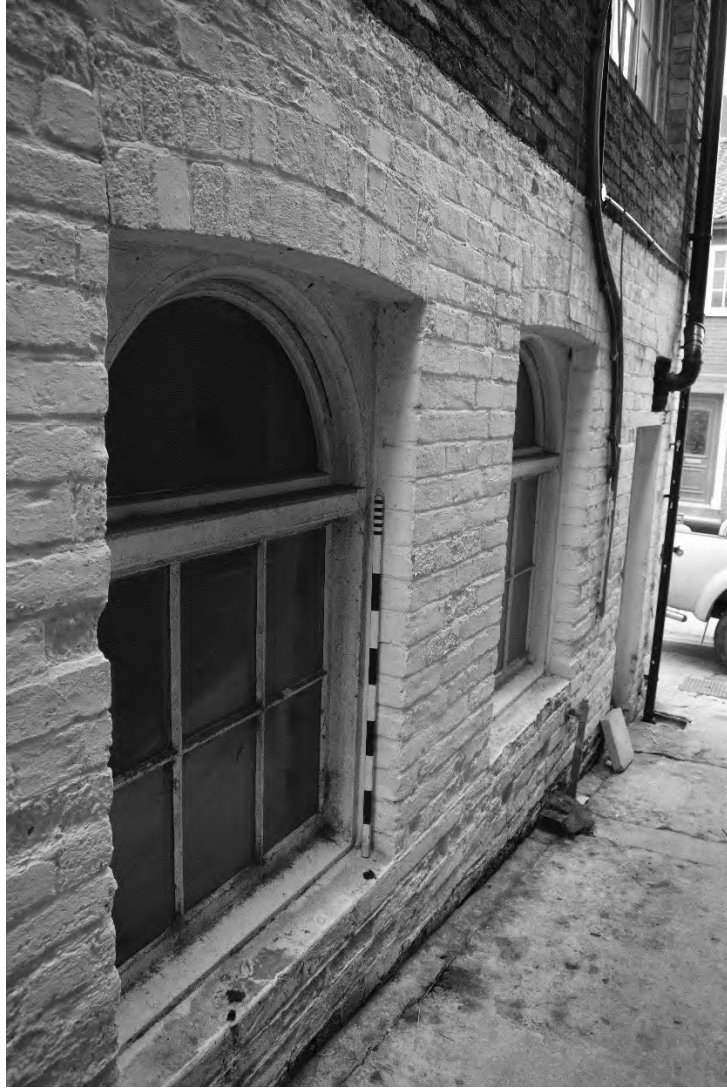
Exterior West Elevation Windows (DSC_0667). Facing South-east.
